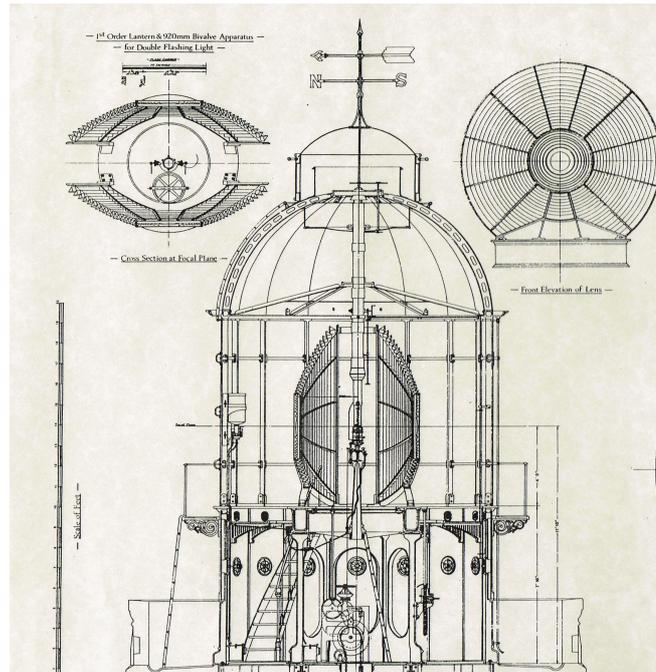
Elevation plan of Cape Bryon Lighthouse showing light mechanism and circular balcony
